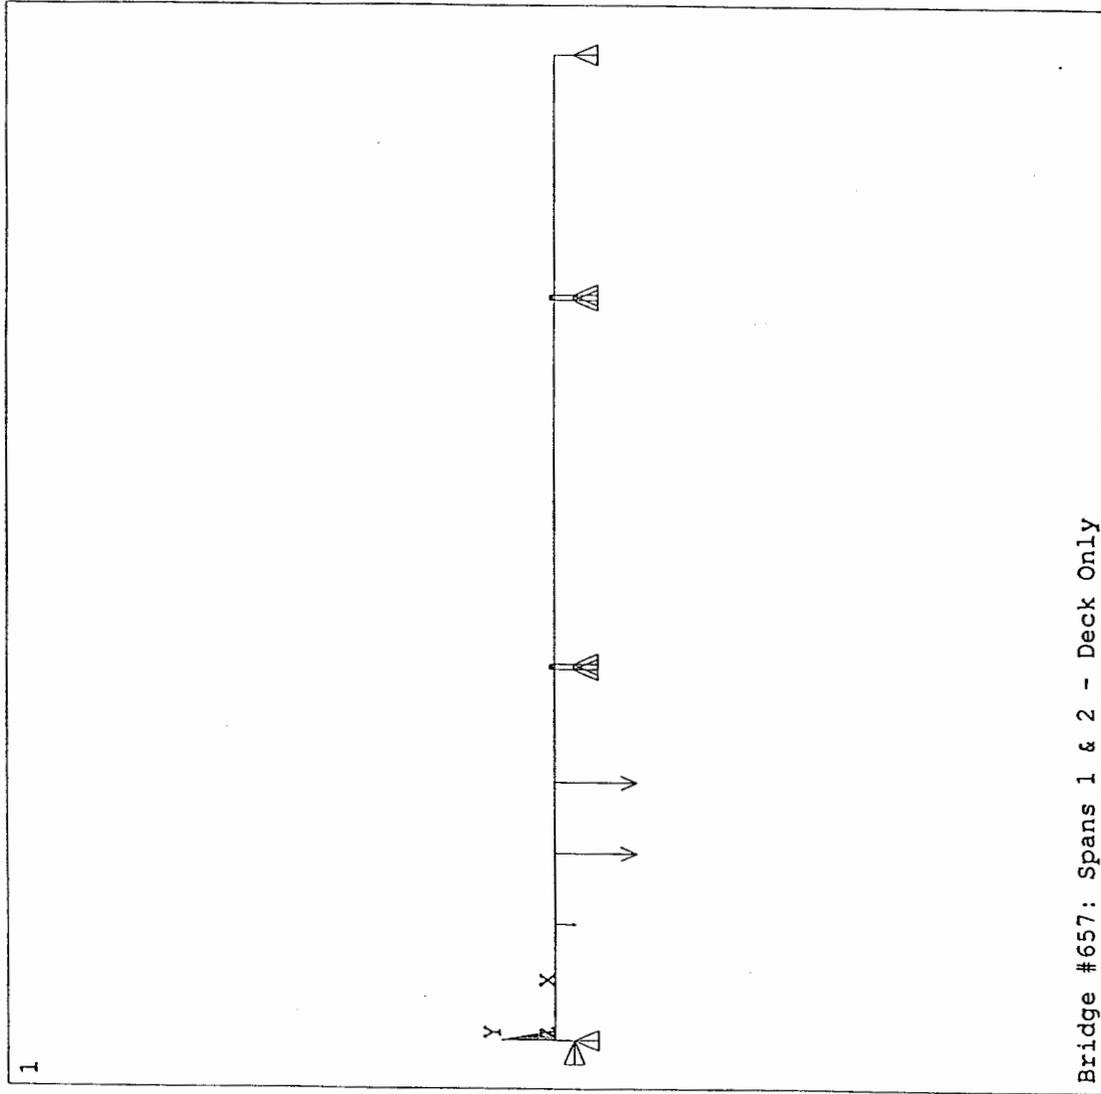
Bridge #657: Spans 1 and 2 - Model Plot
